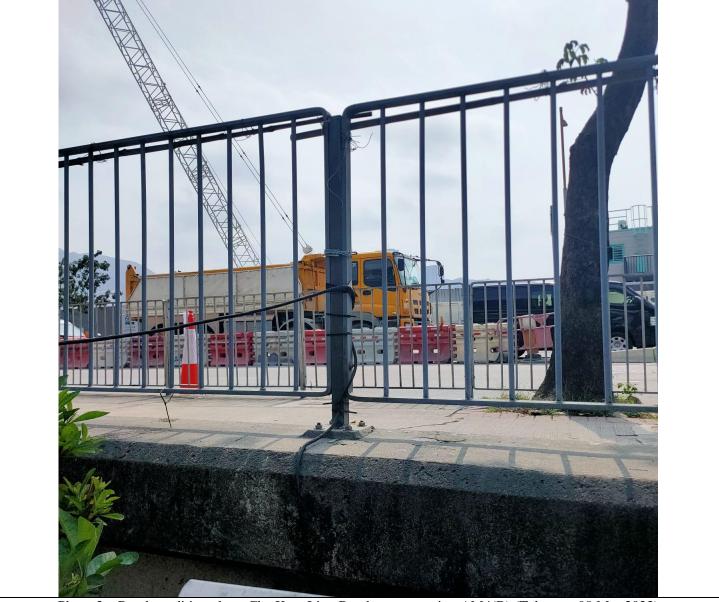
Road condition along Cha Kwo Ling Road next to station AM4(B) (Taken on 08 Mar 2023)
